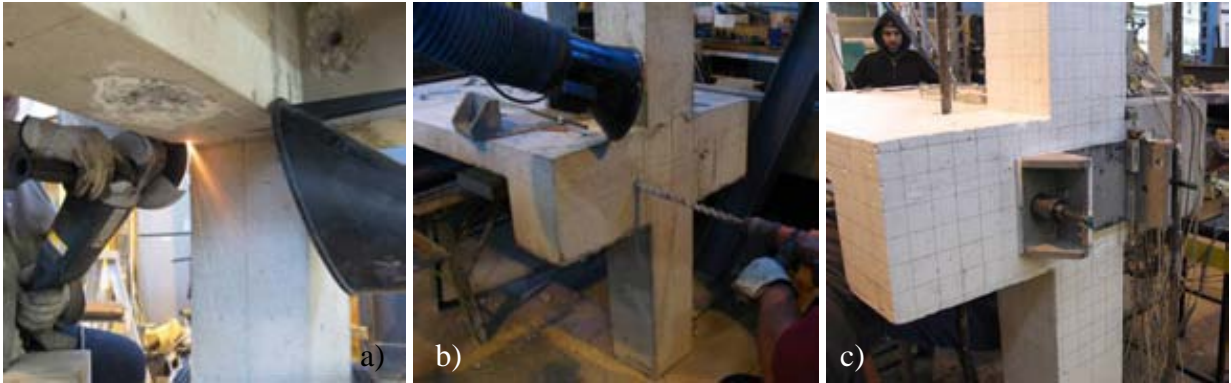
Retrofitting beam-column joint with slab, SL-R3: a) beam weakening; b) drilling through transverse beam for post-tensioning tendons; c) external post-tensioning anchorage at the external joint face.
